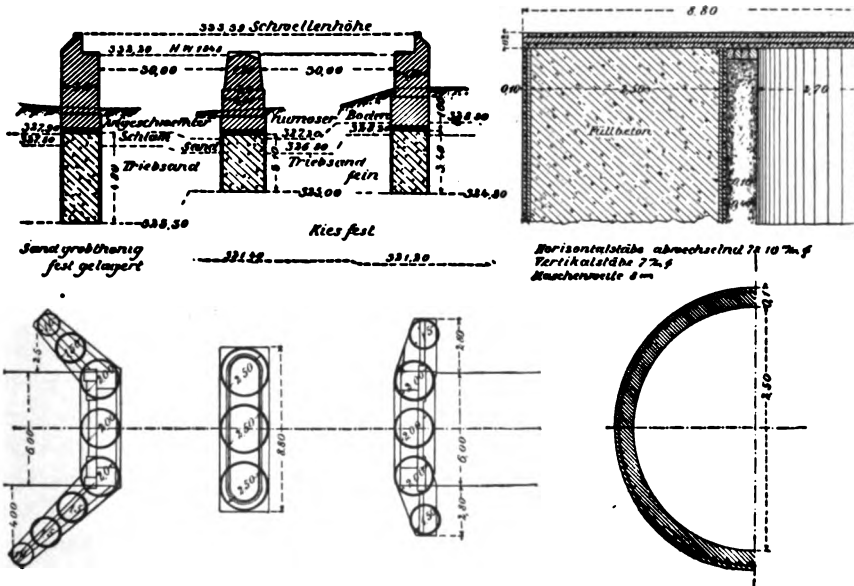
Well casing foundations for the Kocher Bridge at Bröckingen.
